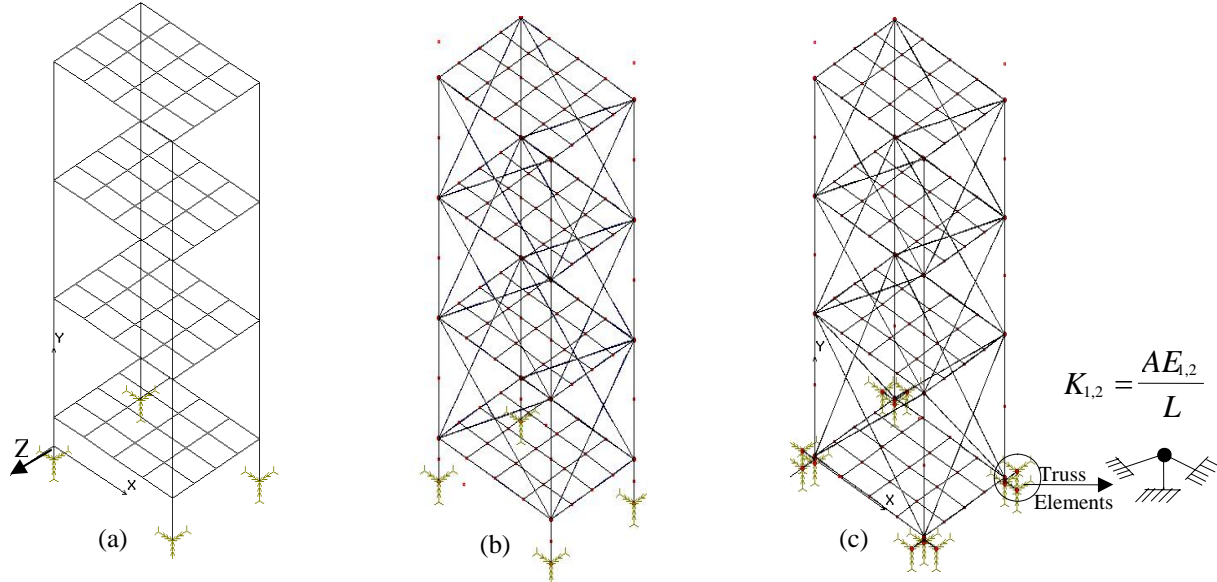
(a) FE model of normal building without infill wall; (b) FE model of normal building with in-fill wall as equivalent strut; (c) FE model of isolated building
